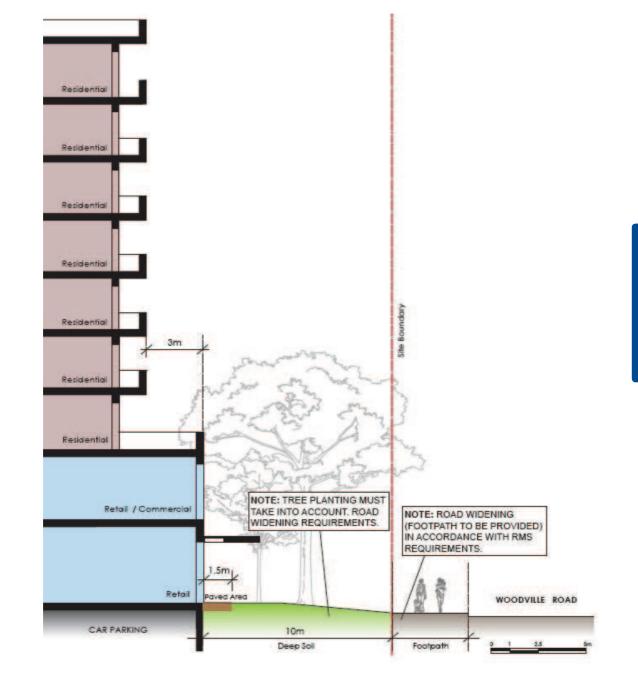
Woodville Road Setbacks (Section B-B)
